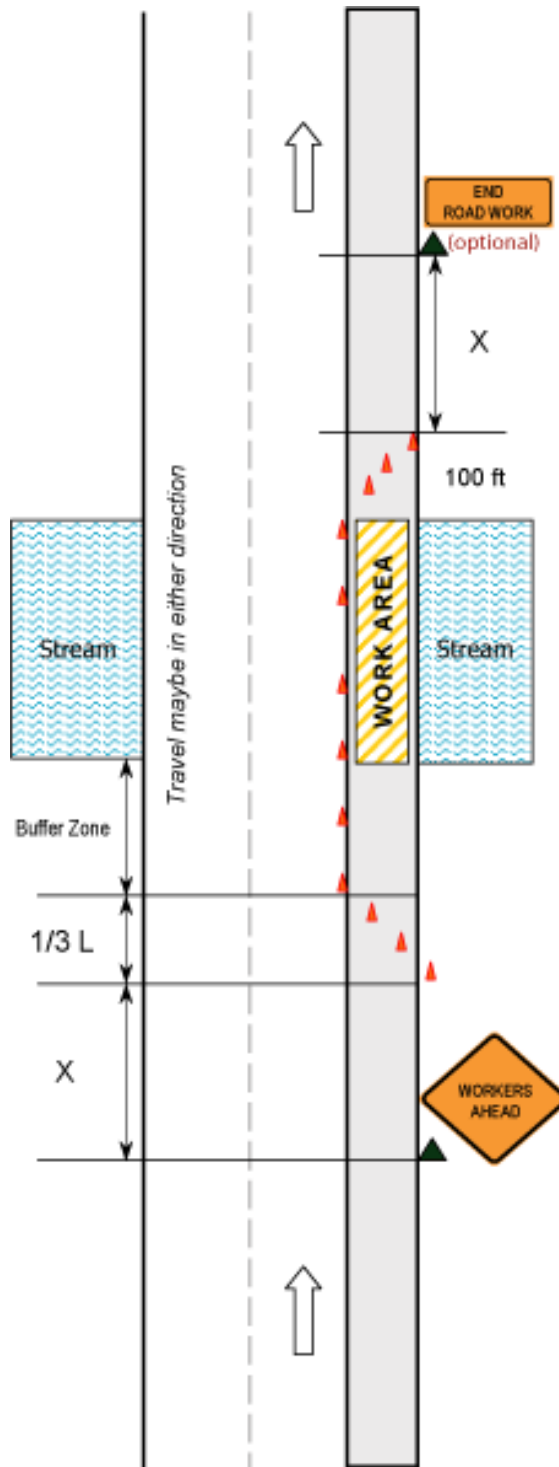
Diagram of a traffic control plan for short term, greater than one hour. From U.S. Department of Transportation, Federal Highway Administration, 2009).
